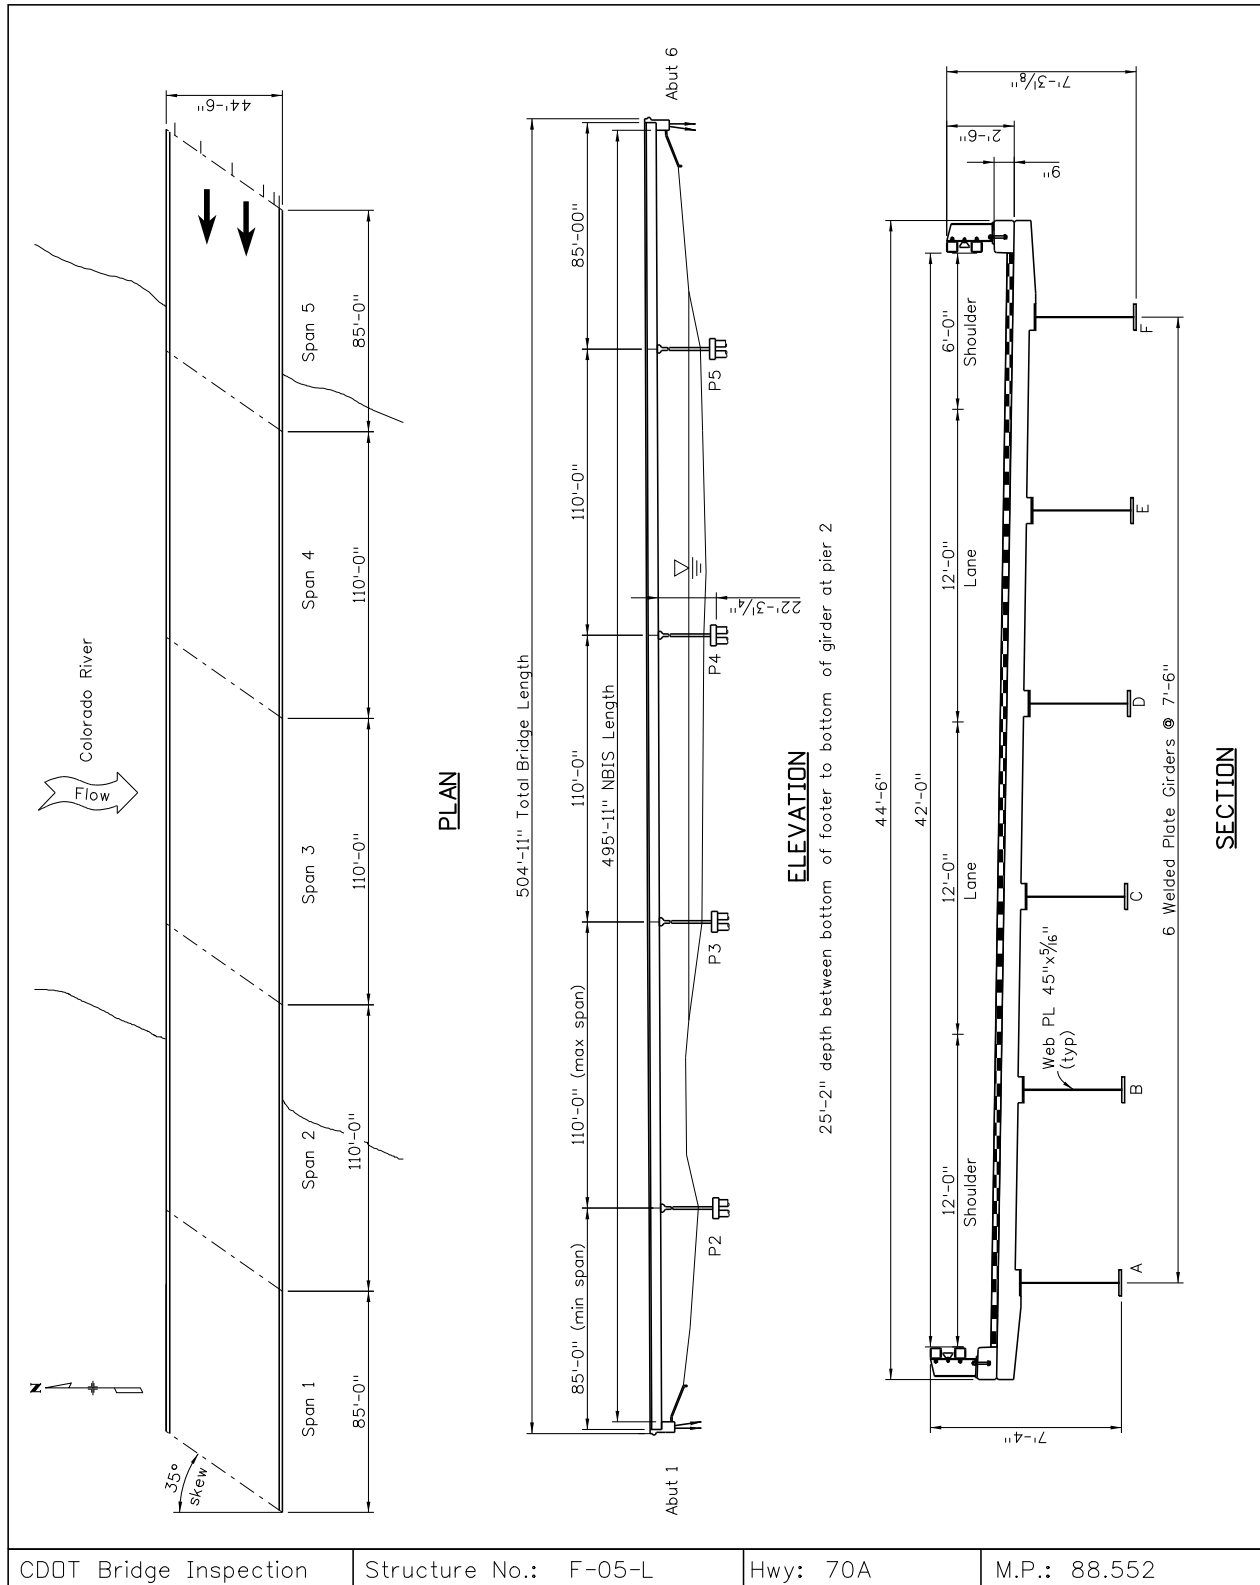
Bridge Inspection Sketch – Example 1
